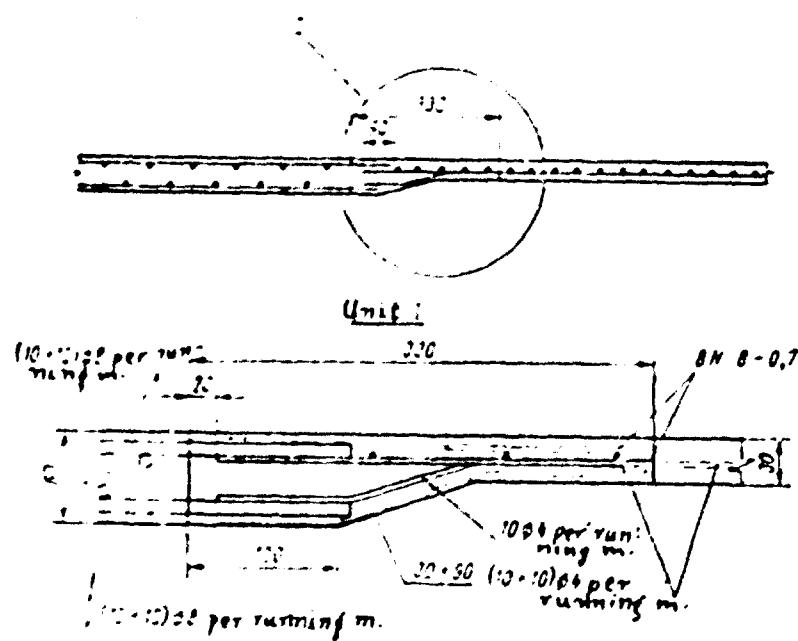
Connection of the Reinforced Concrete and Ferroconcrete Plates. Key: a) unit 1, b) per running meter.
